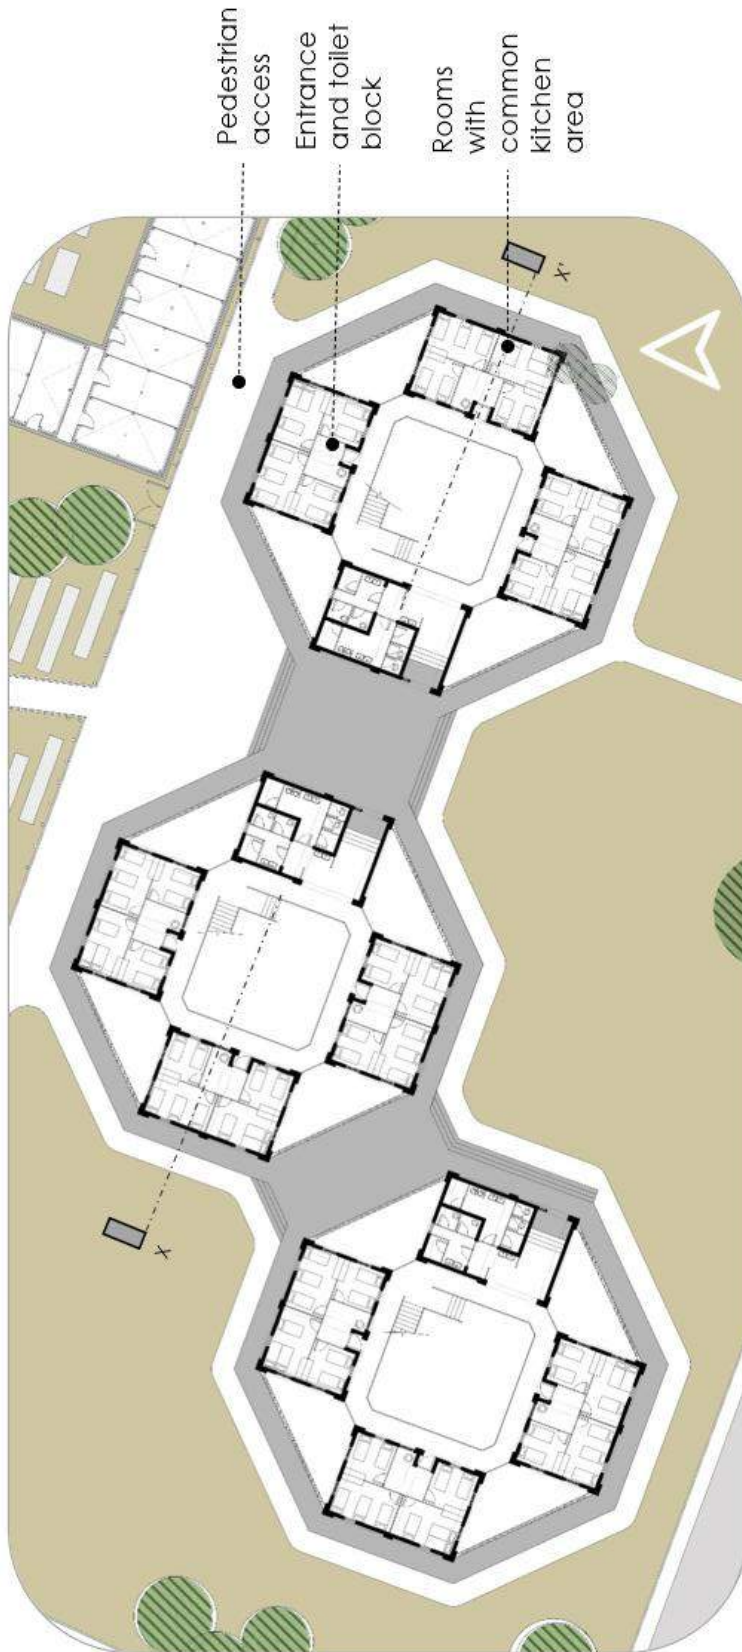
Ground Floor Plan of Mass Housing for Transient Fishermen (Source: Author)
